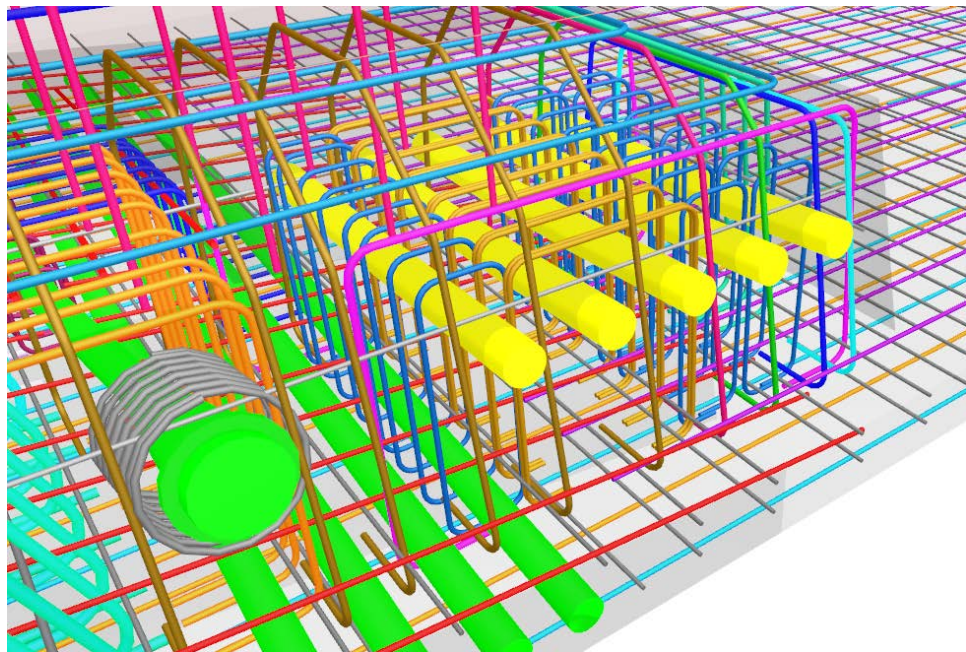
Three-Dimensional Model Illustrating Confinement Reinforcement Around Anchorage and Deviation Blocks (Click to Open Interactive Model)
